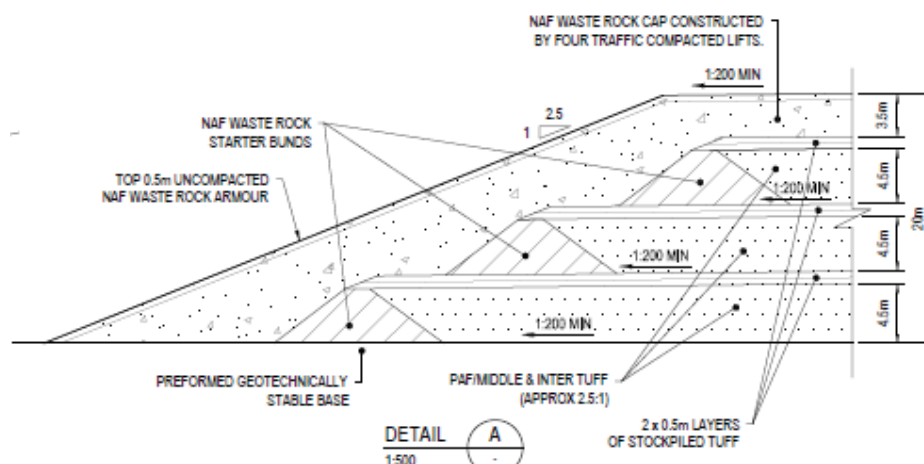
Example of detailed engineered co disposal where under-slope PAF disposal is required
